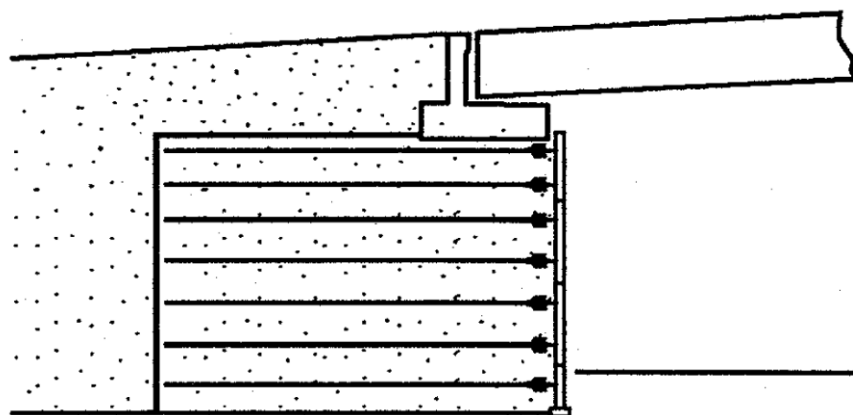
Typical Mechanically Stabilized Abutment (Wahls, 1990)
